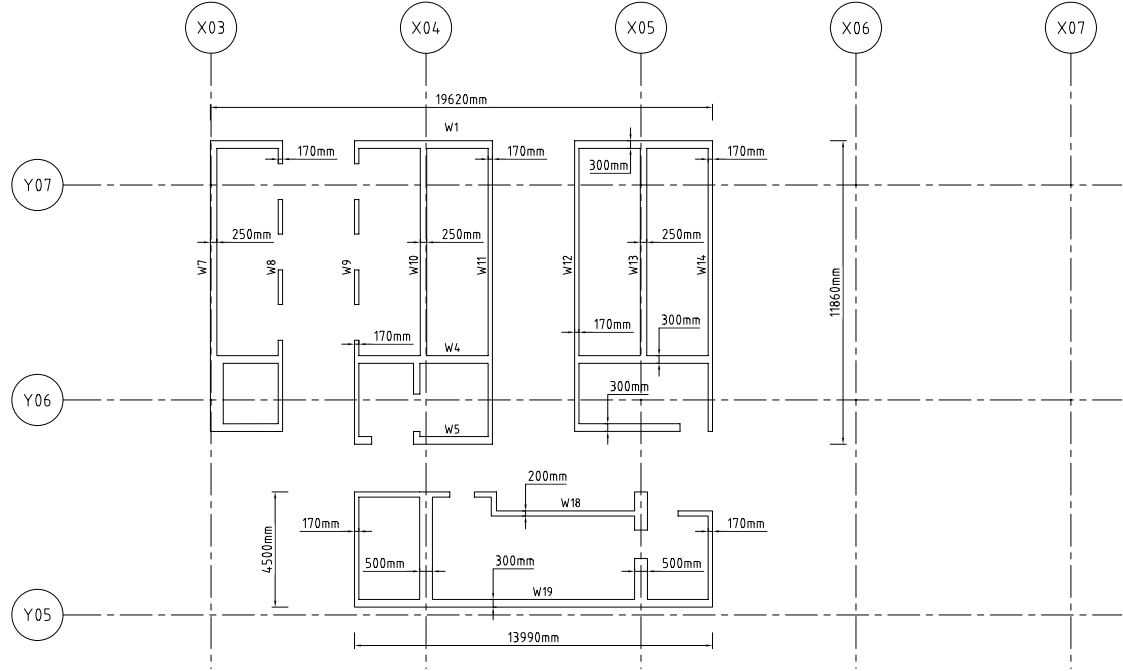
Level 37 Core Plan (Source: Hyder Consulting)
